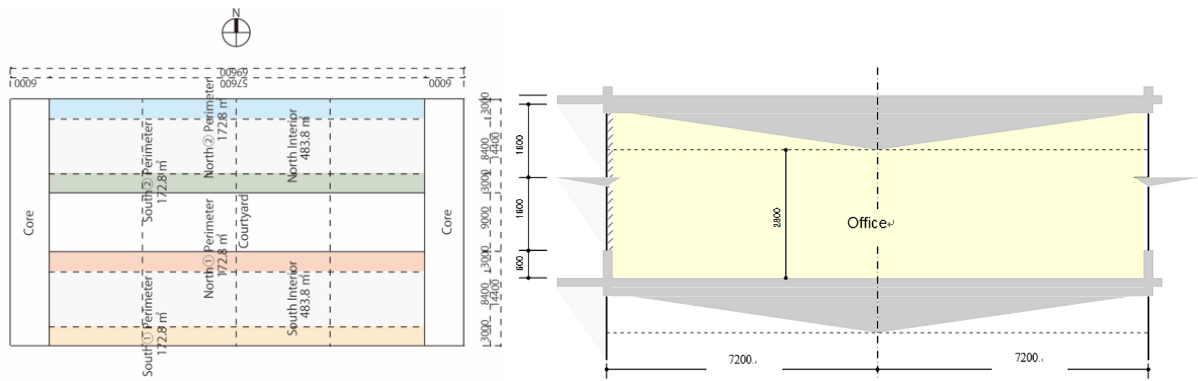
Floor plan (left) and office (right) of the large office building used in the Japanese case study
